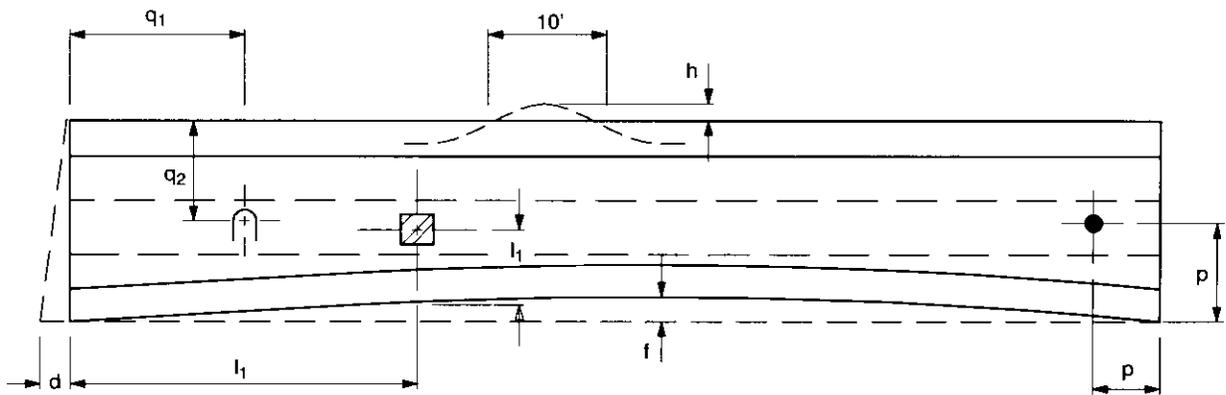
I Beams (Girders) or Bulb Tee Girders
